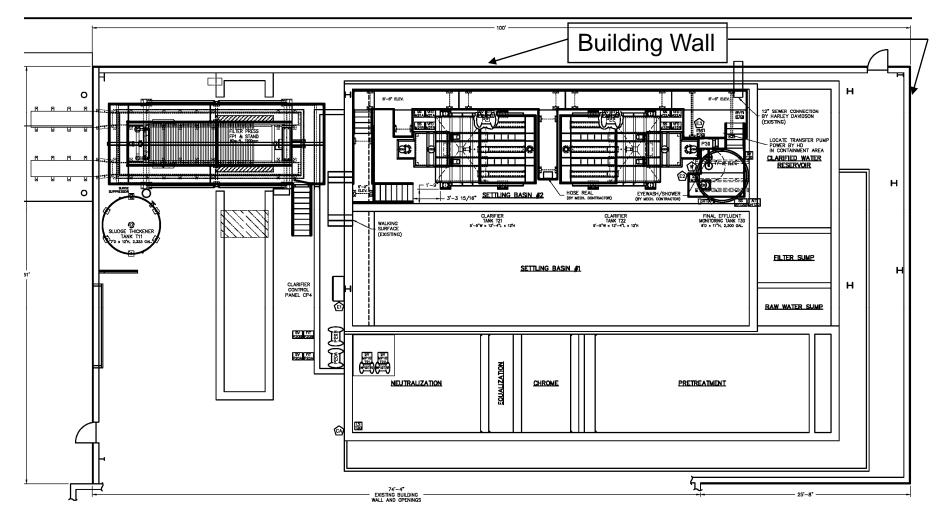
June 20, 2007 proposed (existing) layout [J. Mark Systems] showing Bldg 41 wastewater tank area only. Note proposed use of northern settling basin with a new lamella clarifier; new location of sludge filter press (indoors); and existing sludge pit (west of settling basins). Building walls and current roof over the WWTP basins was constructed circa 1980, according to other available construction drawings.
